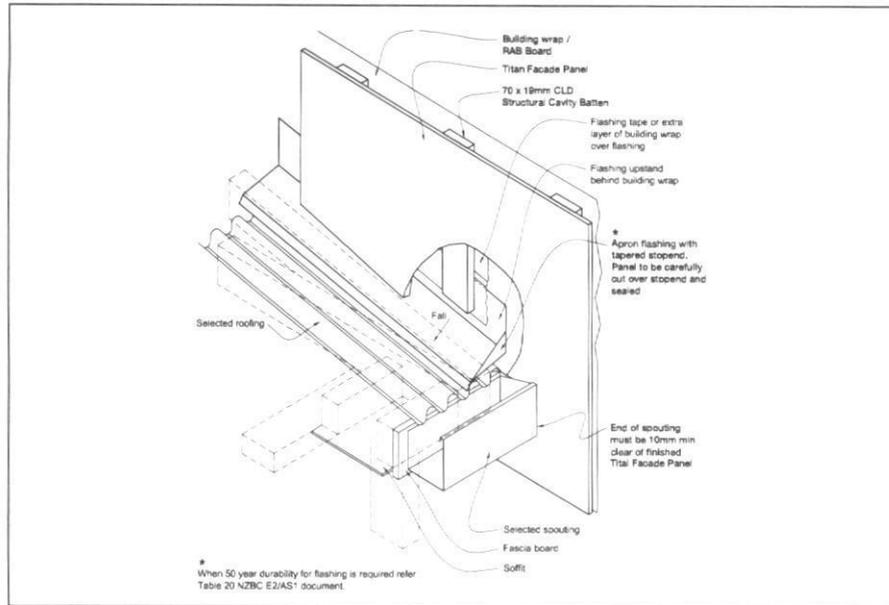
ROOF TO WALL JUNCTION DETAIL
